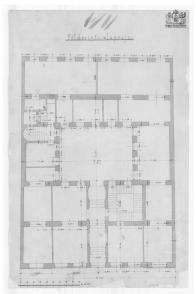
Ground floor plan https://ybl.bparchiv.hu/
